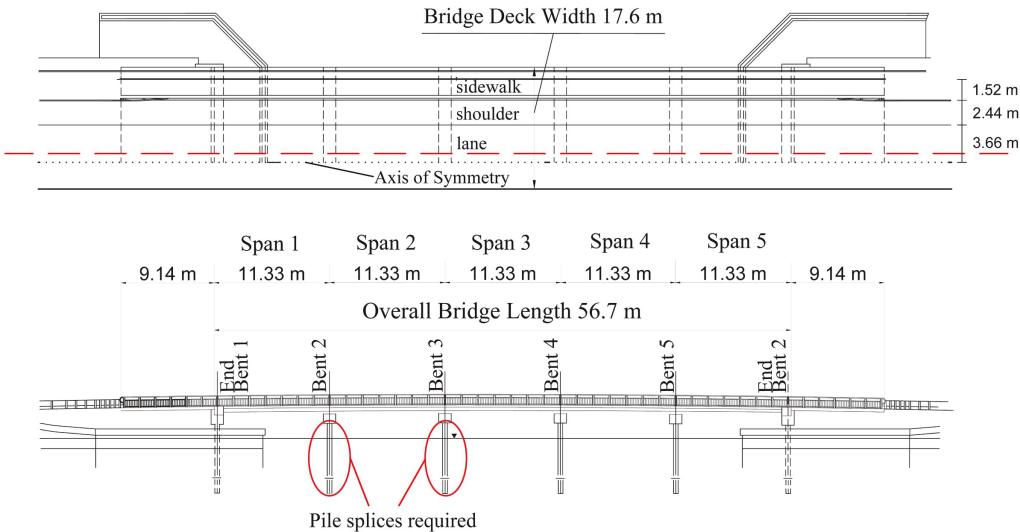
Plan and elevation views of the new Halls River Bridge.
